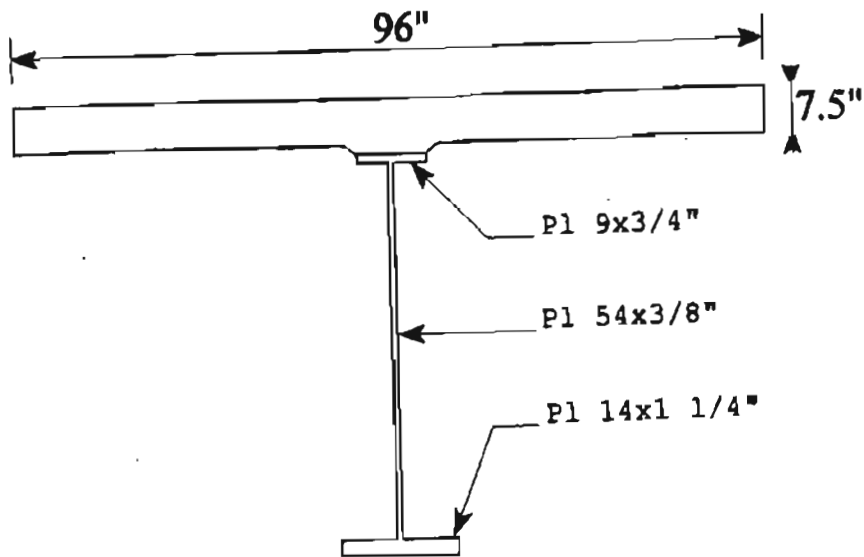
Cross section of the interior girder at midspan with effective width of the concrete slab.
